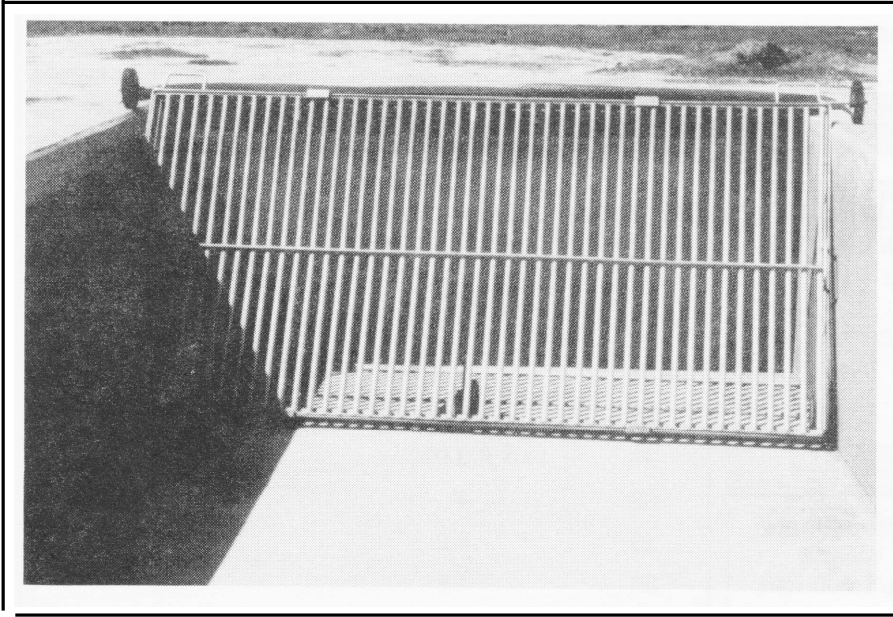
Large panel with wheels on top and bottom to move device in holding tank.
